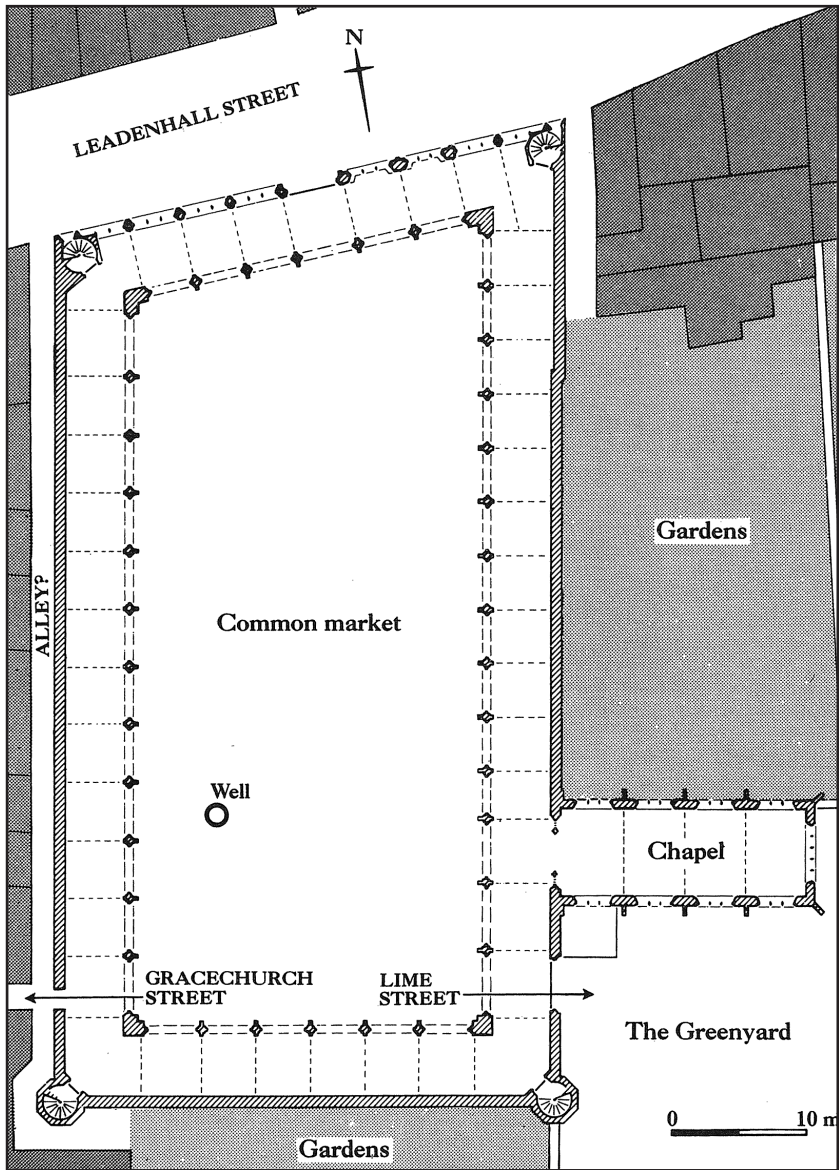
Leadenhall: reconstructed plan (Museum of London)
